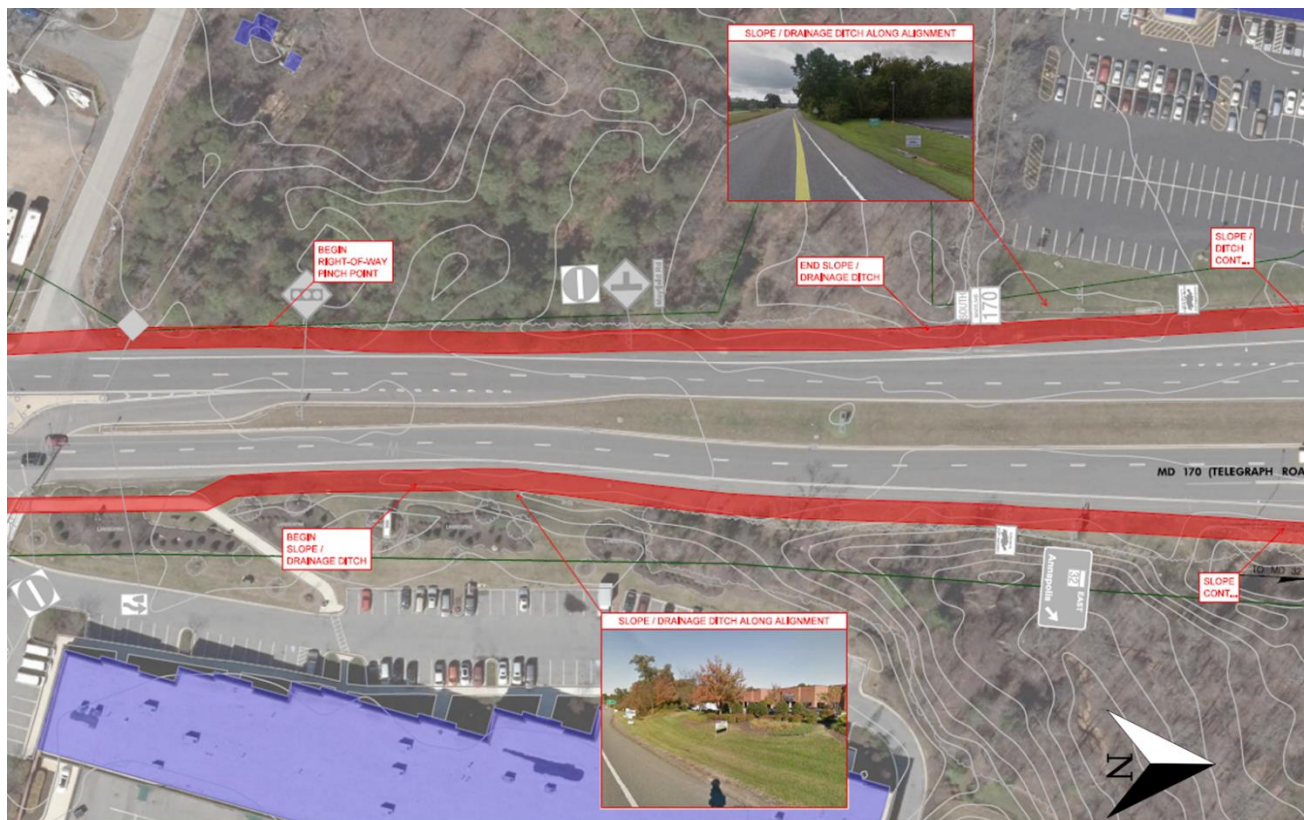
Telegraph Road, south of MD 32, highlighting open section roadway
